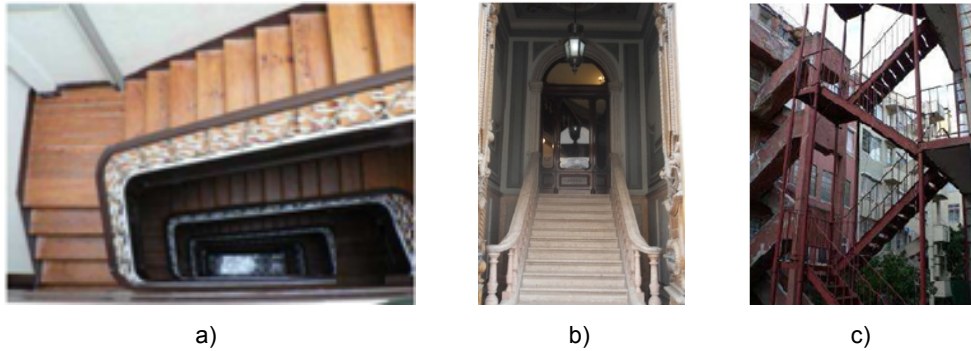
Different types of stairs (Andrade, 2011): a) Interior timber staircase; b) Ground floor masonry staircase; c) Steel staircase from a 'gaioleiro' building.
